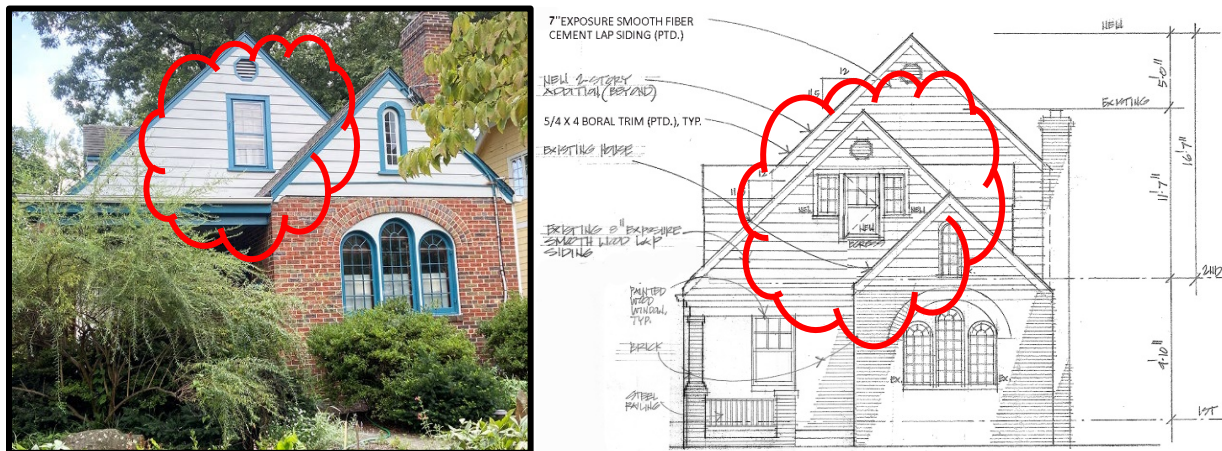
The existing window, left, will be replaced and two casement windows will be installed to either side of it.
